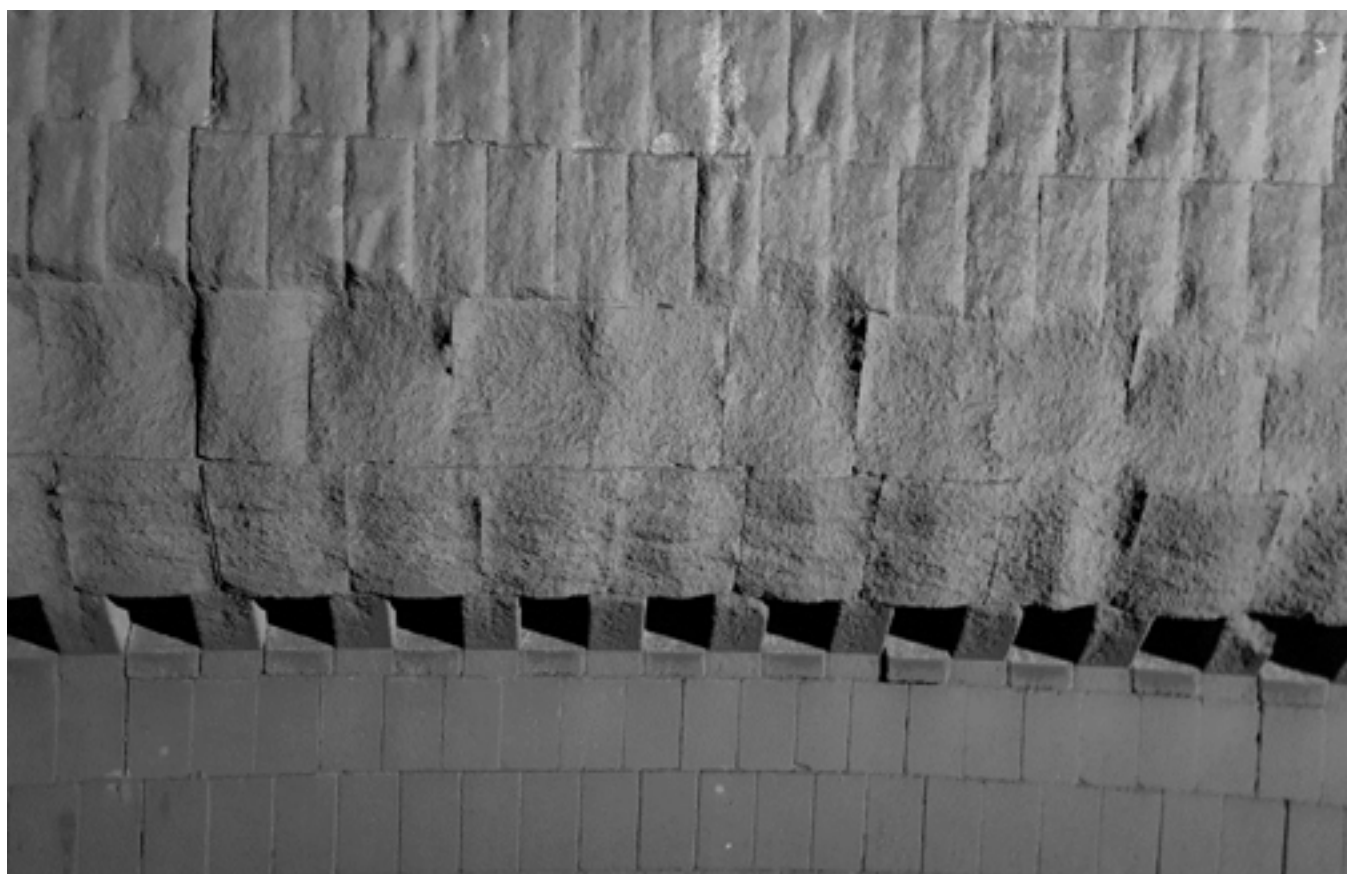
Shaft lining with open joint/expansion joint after shutdown, filled with pellets
